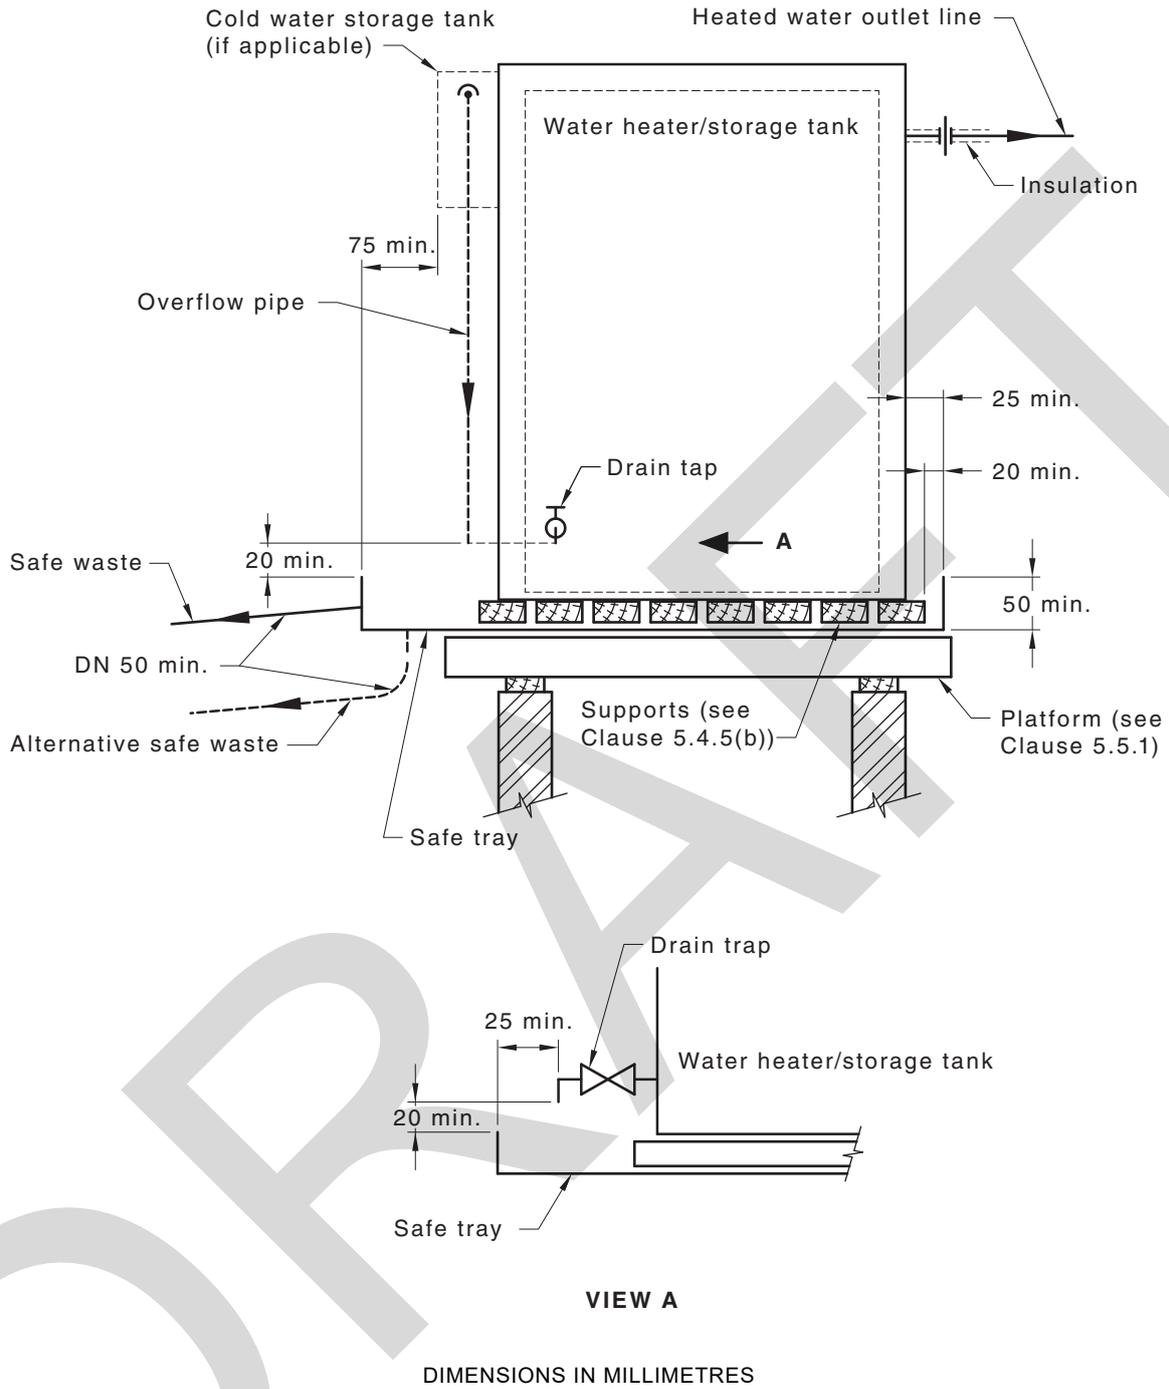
TYPICAL INSTALLATION OF A SAFE TRAY AND POSITION OF WATER HEATER OR COLD WATER STORAGE TANK
